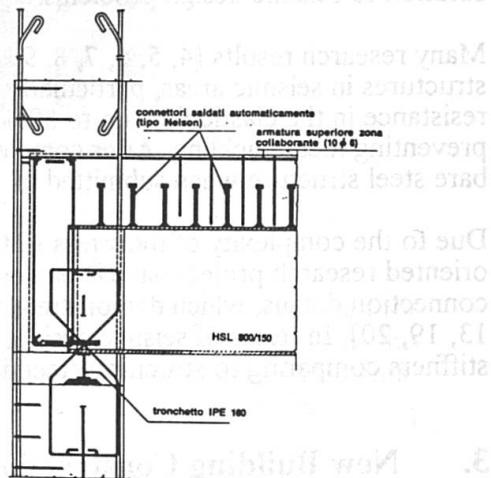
Composite MRF subsystem made of RC columns and steel-RC composite beams.
